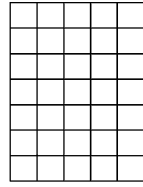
Type A – 10-storey RC building (15 m × 21 m).
